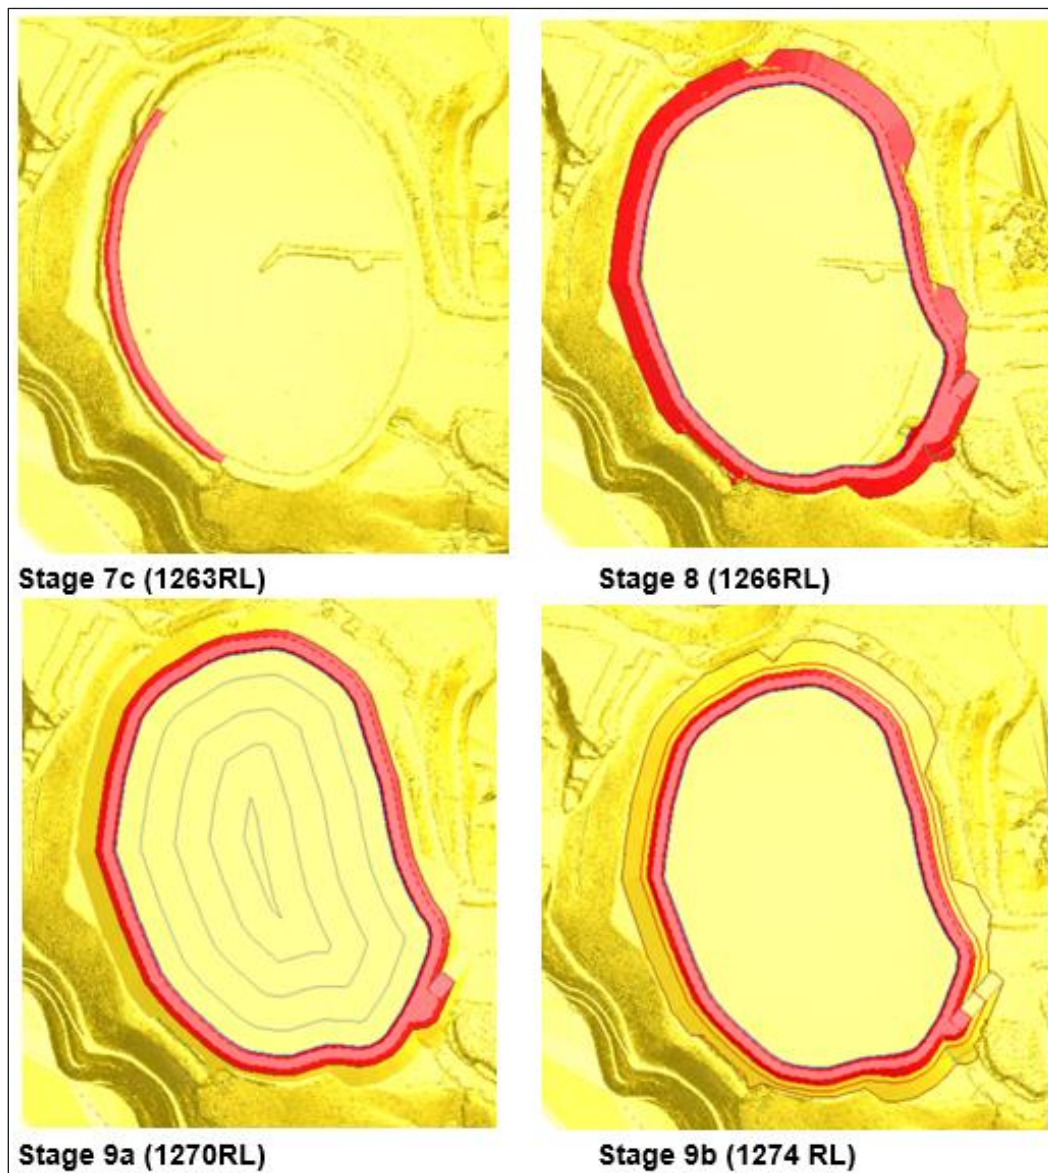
Approved TSF Design. Note: decant road raise not shown for simplicity.
